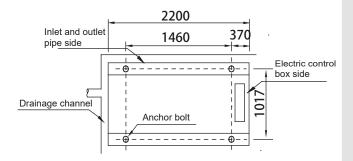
Top view of schematic diagram of installation dimension of 110KW&140KW
